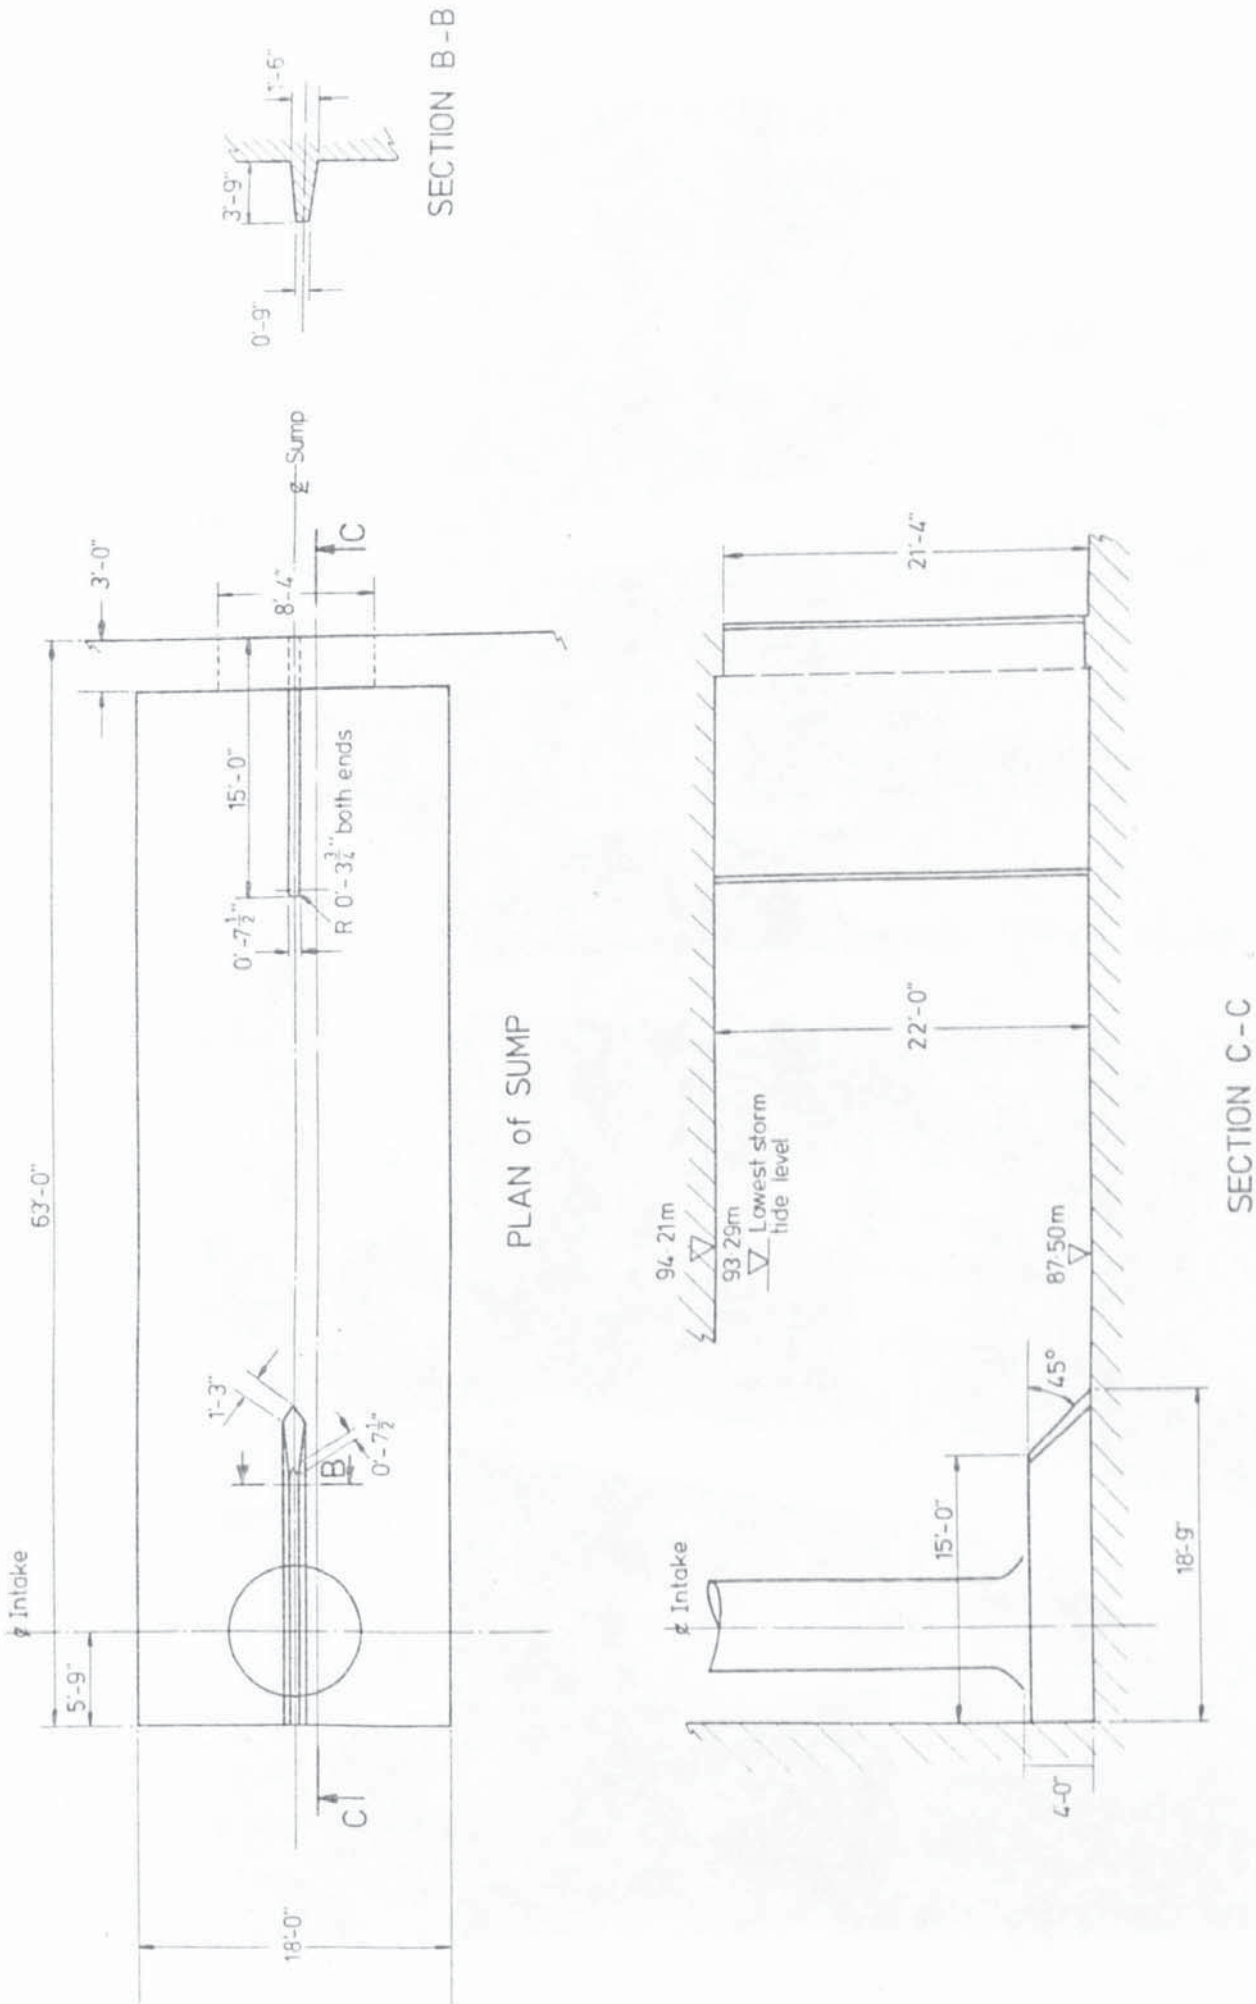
Plan view and section of final design of one pump bay (No. 2 unit)
